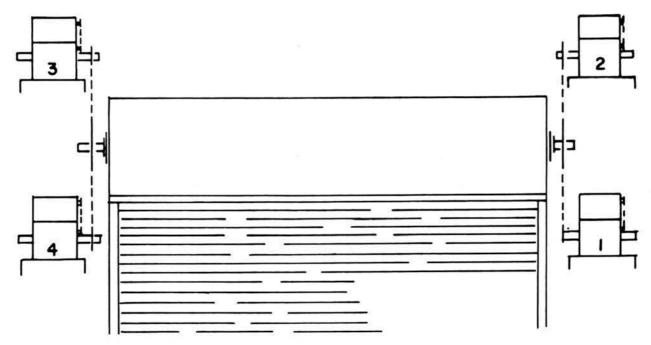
STEEL ROLLING DOOR OPTIONAL SHELF POSITIONS FOR MOUNTING OPERATOR
